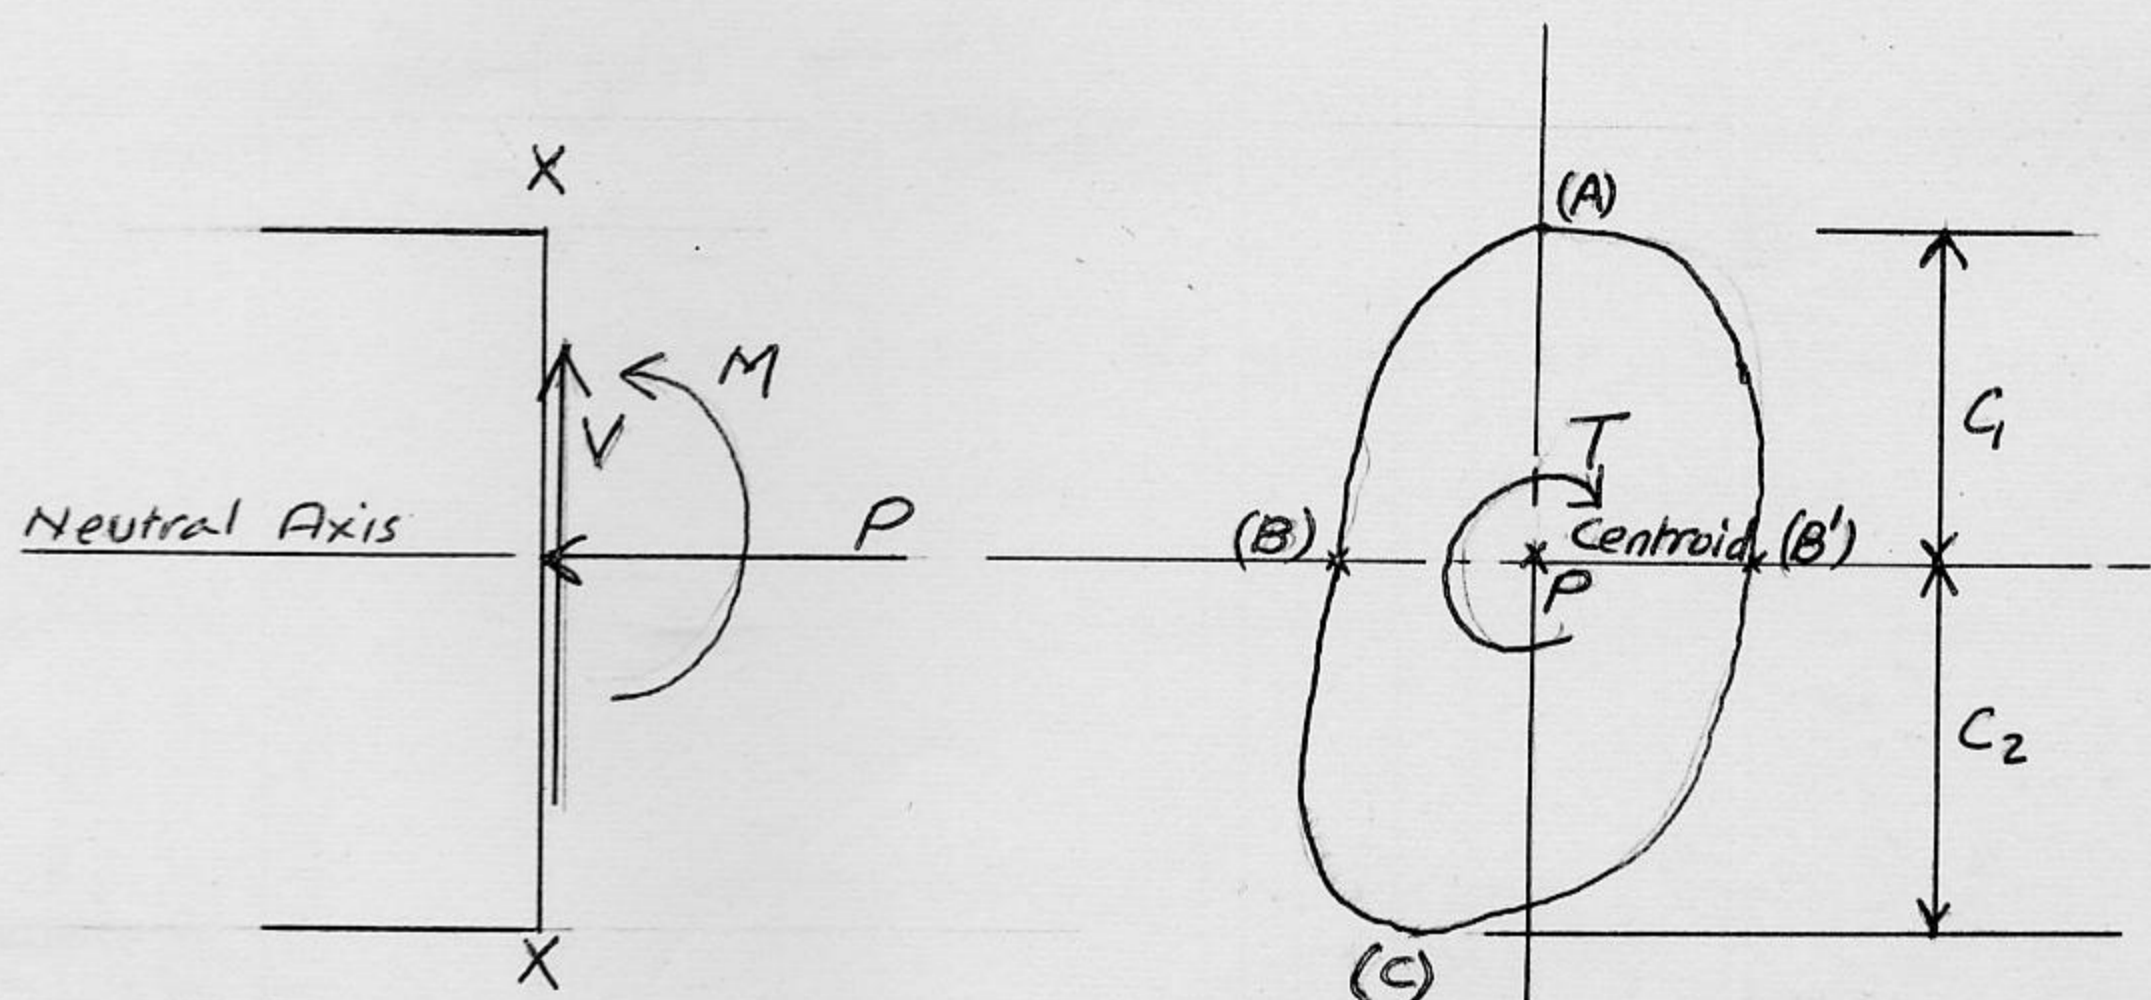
An Uncracked Section of a Prestressed Member
